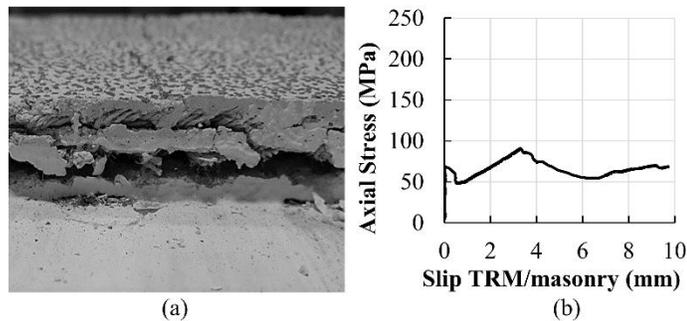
(a) Typical failure mode of F2-TRM bond series (side view); (b) slip of TRM to masonry for specimen F2L2-260-100-3.
